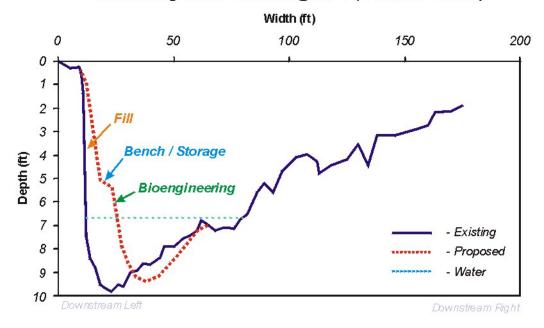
Proposed cross-section at location of existing Monitoring Site for SD-5.
